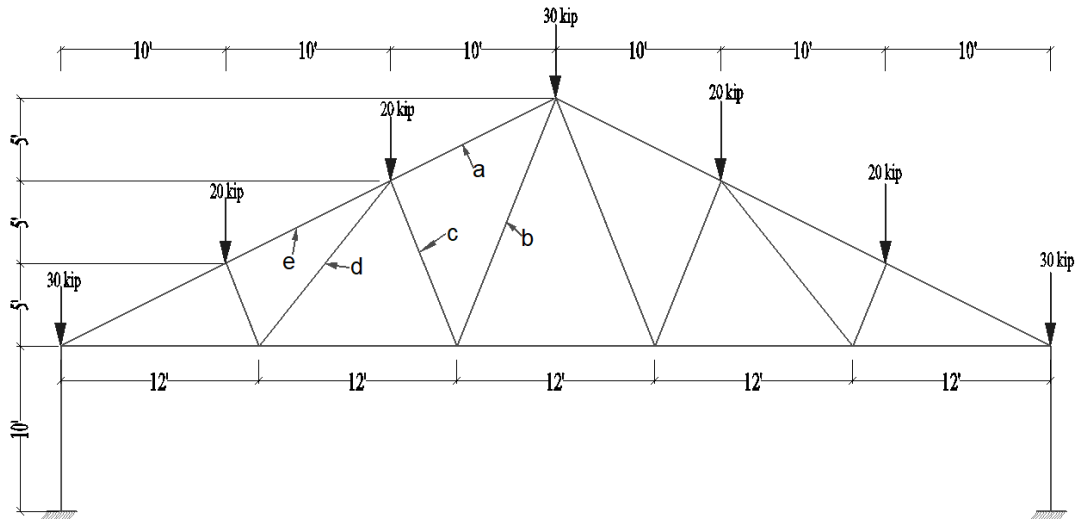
Two Dimensional View of the Roof Truss (Fink Type)
